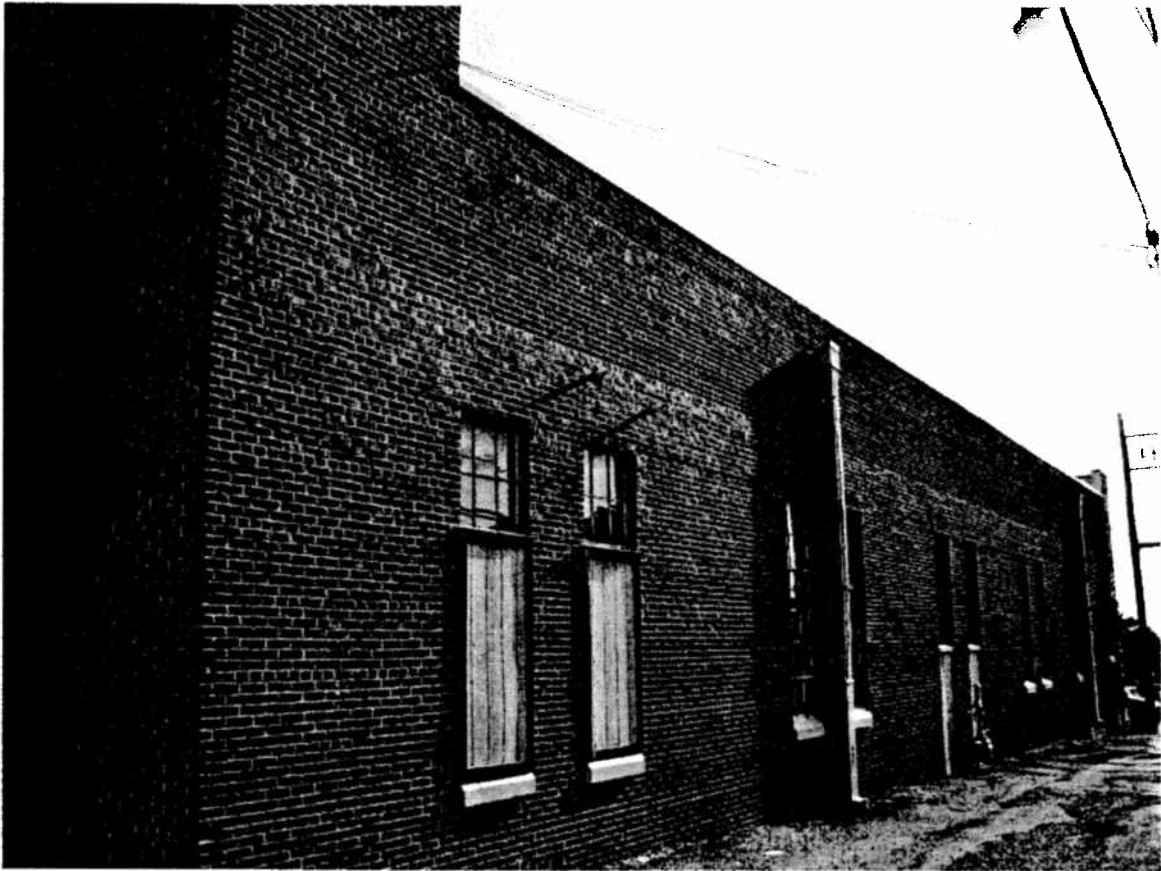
Healdton Armory – southwest corner facing west-northwest (note crack on southwest corner wall (left) and roof drains).
